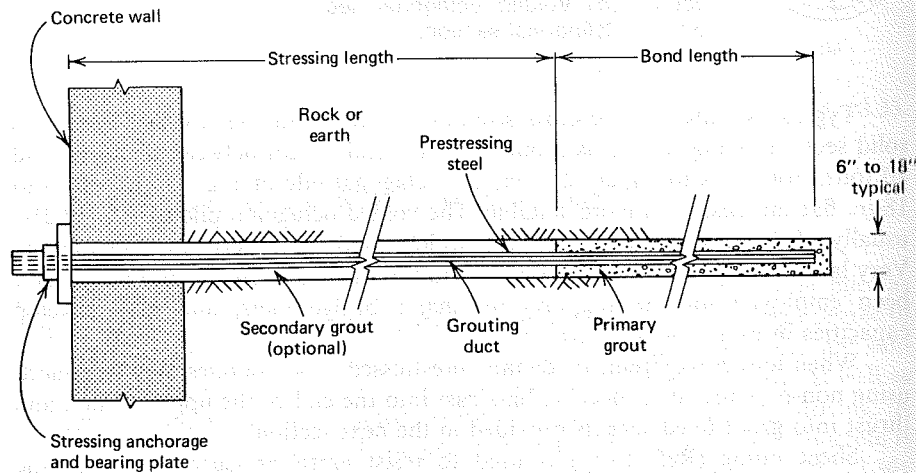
Prestressed rock anchor in drilled hole. Adapted from Ref. 13.41.
